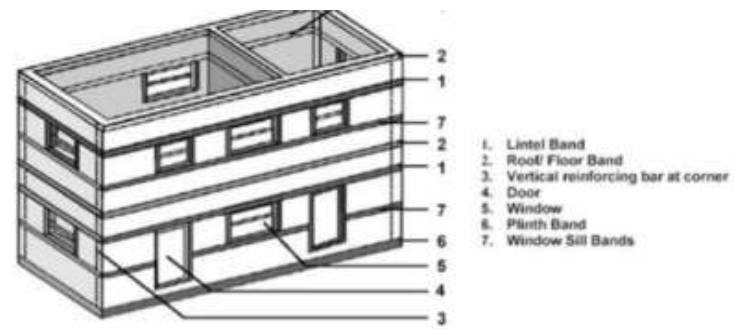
Seismic bands at different levels (Providing vertical reinforcement at important locations such as corners, internal and external wall junctions)
